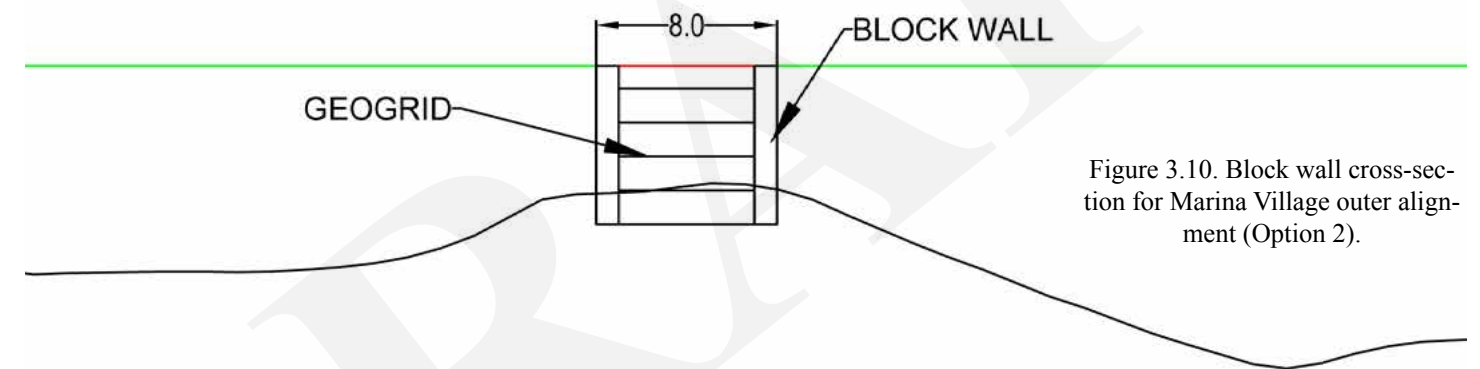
Block wall cross-section for Marina Village outer alignment (Option 2).
